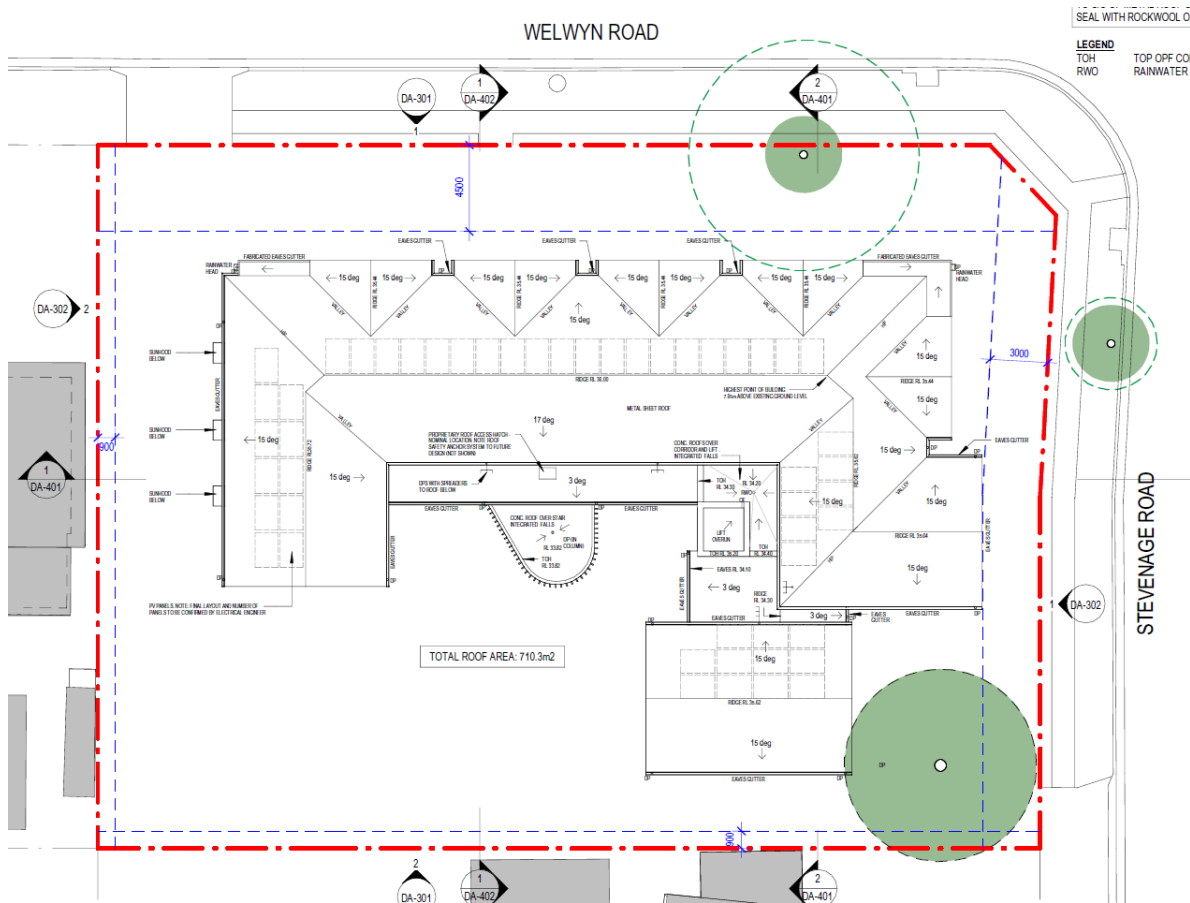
Extract from Architectural Plans –Roof Plan (Source: Architectural Plans, Become, dated 26.03.2025)
